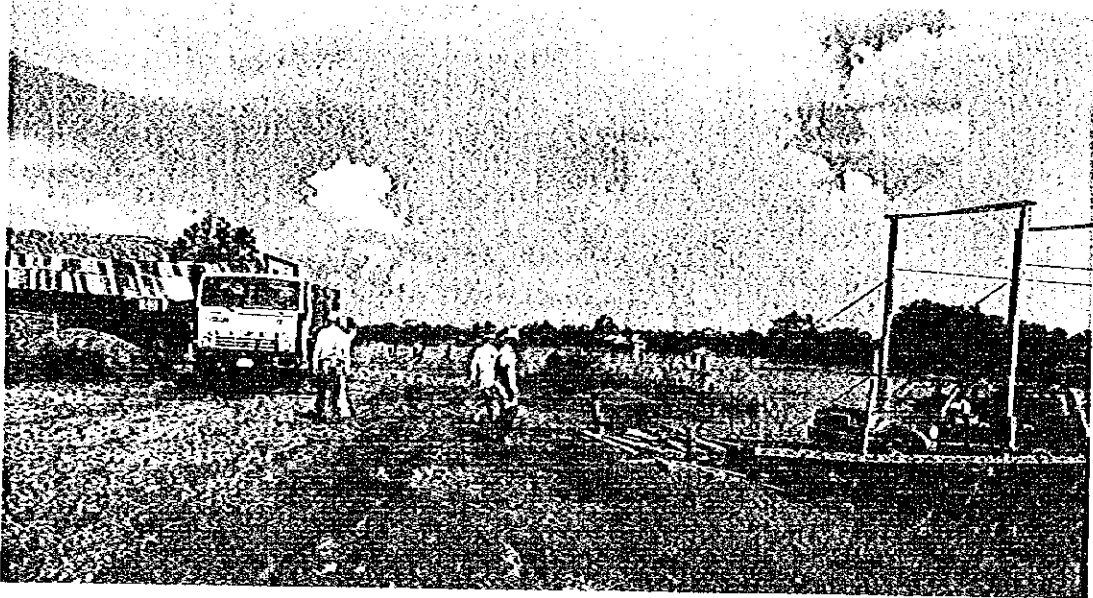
Landscape around the Western Side of Tijamuchi River
